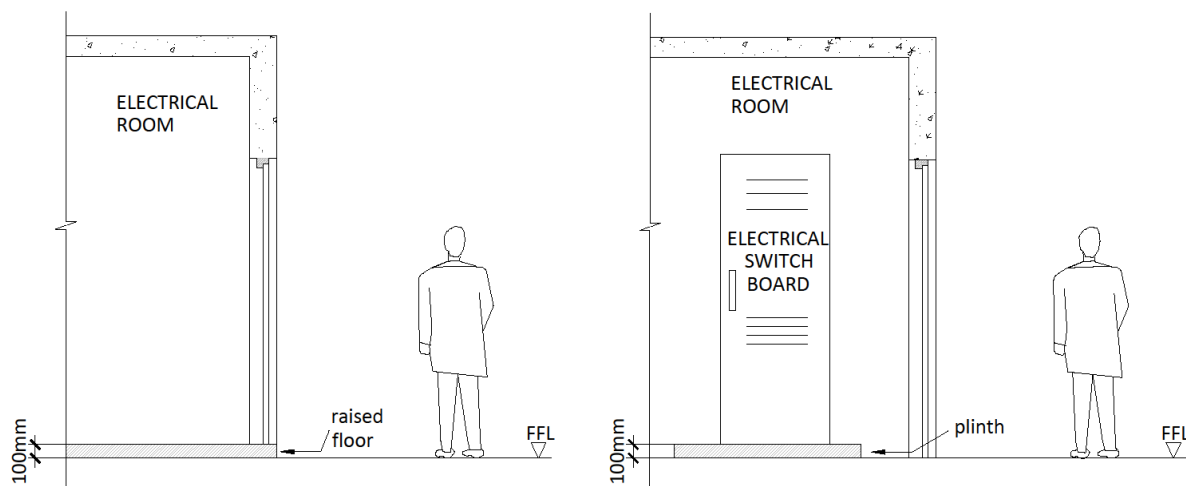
Raised electrical room (left) and switchboard plinth (right)
